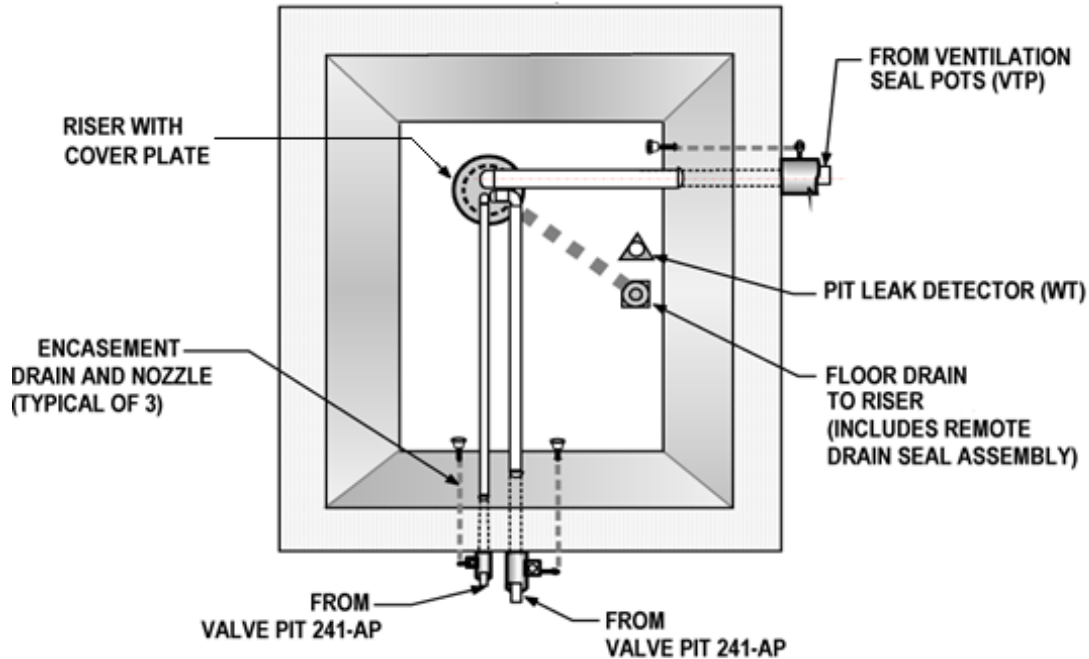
Drain Pit Three-Dimensional Plan View (Tank 241-AP-103)
